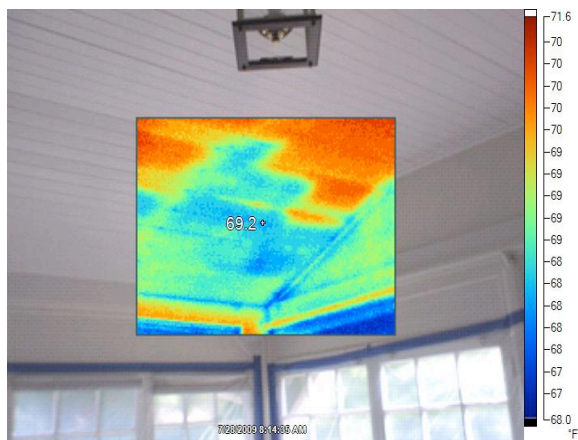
P7 Pre-retrofit thermal leakage in guestroom ceiling
